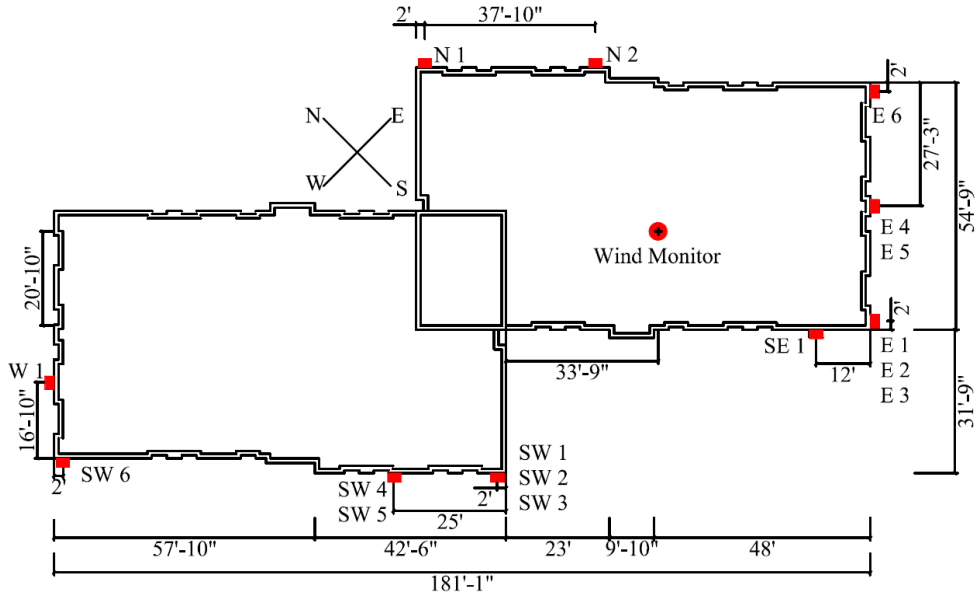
Plan view of McLeod House with driving rain gauge locations
